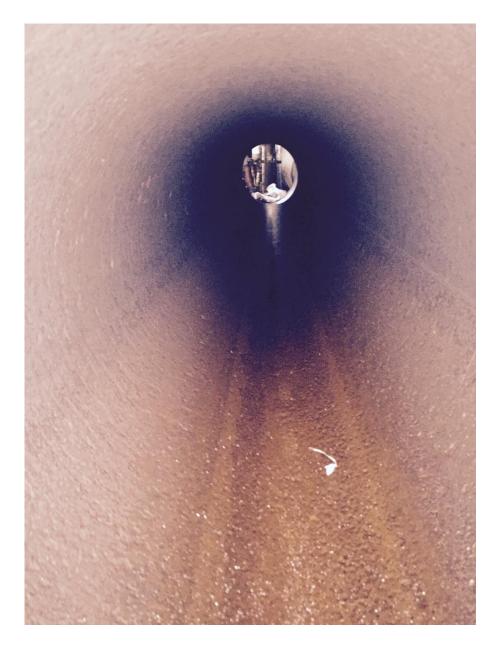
TYPICAL CLEANED SECTION OF PIPING AFTER PIGGING
